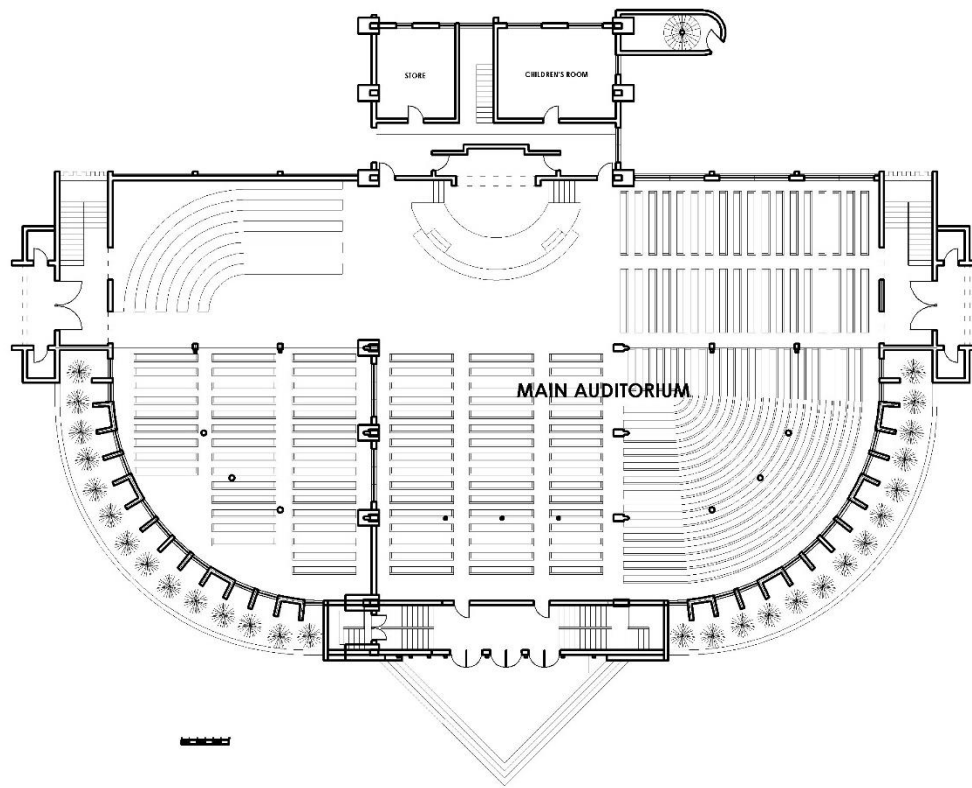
Ground floor plan of Oritamefa Baptist church building.
